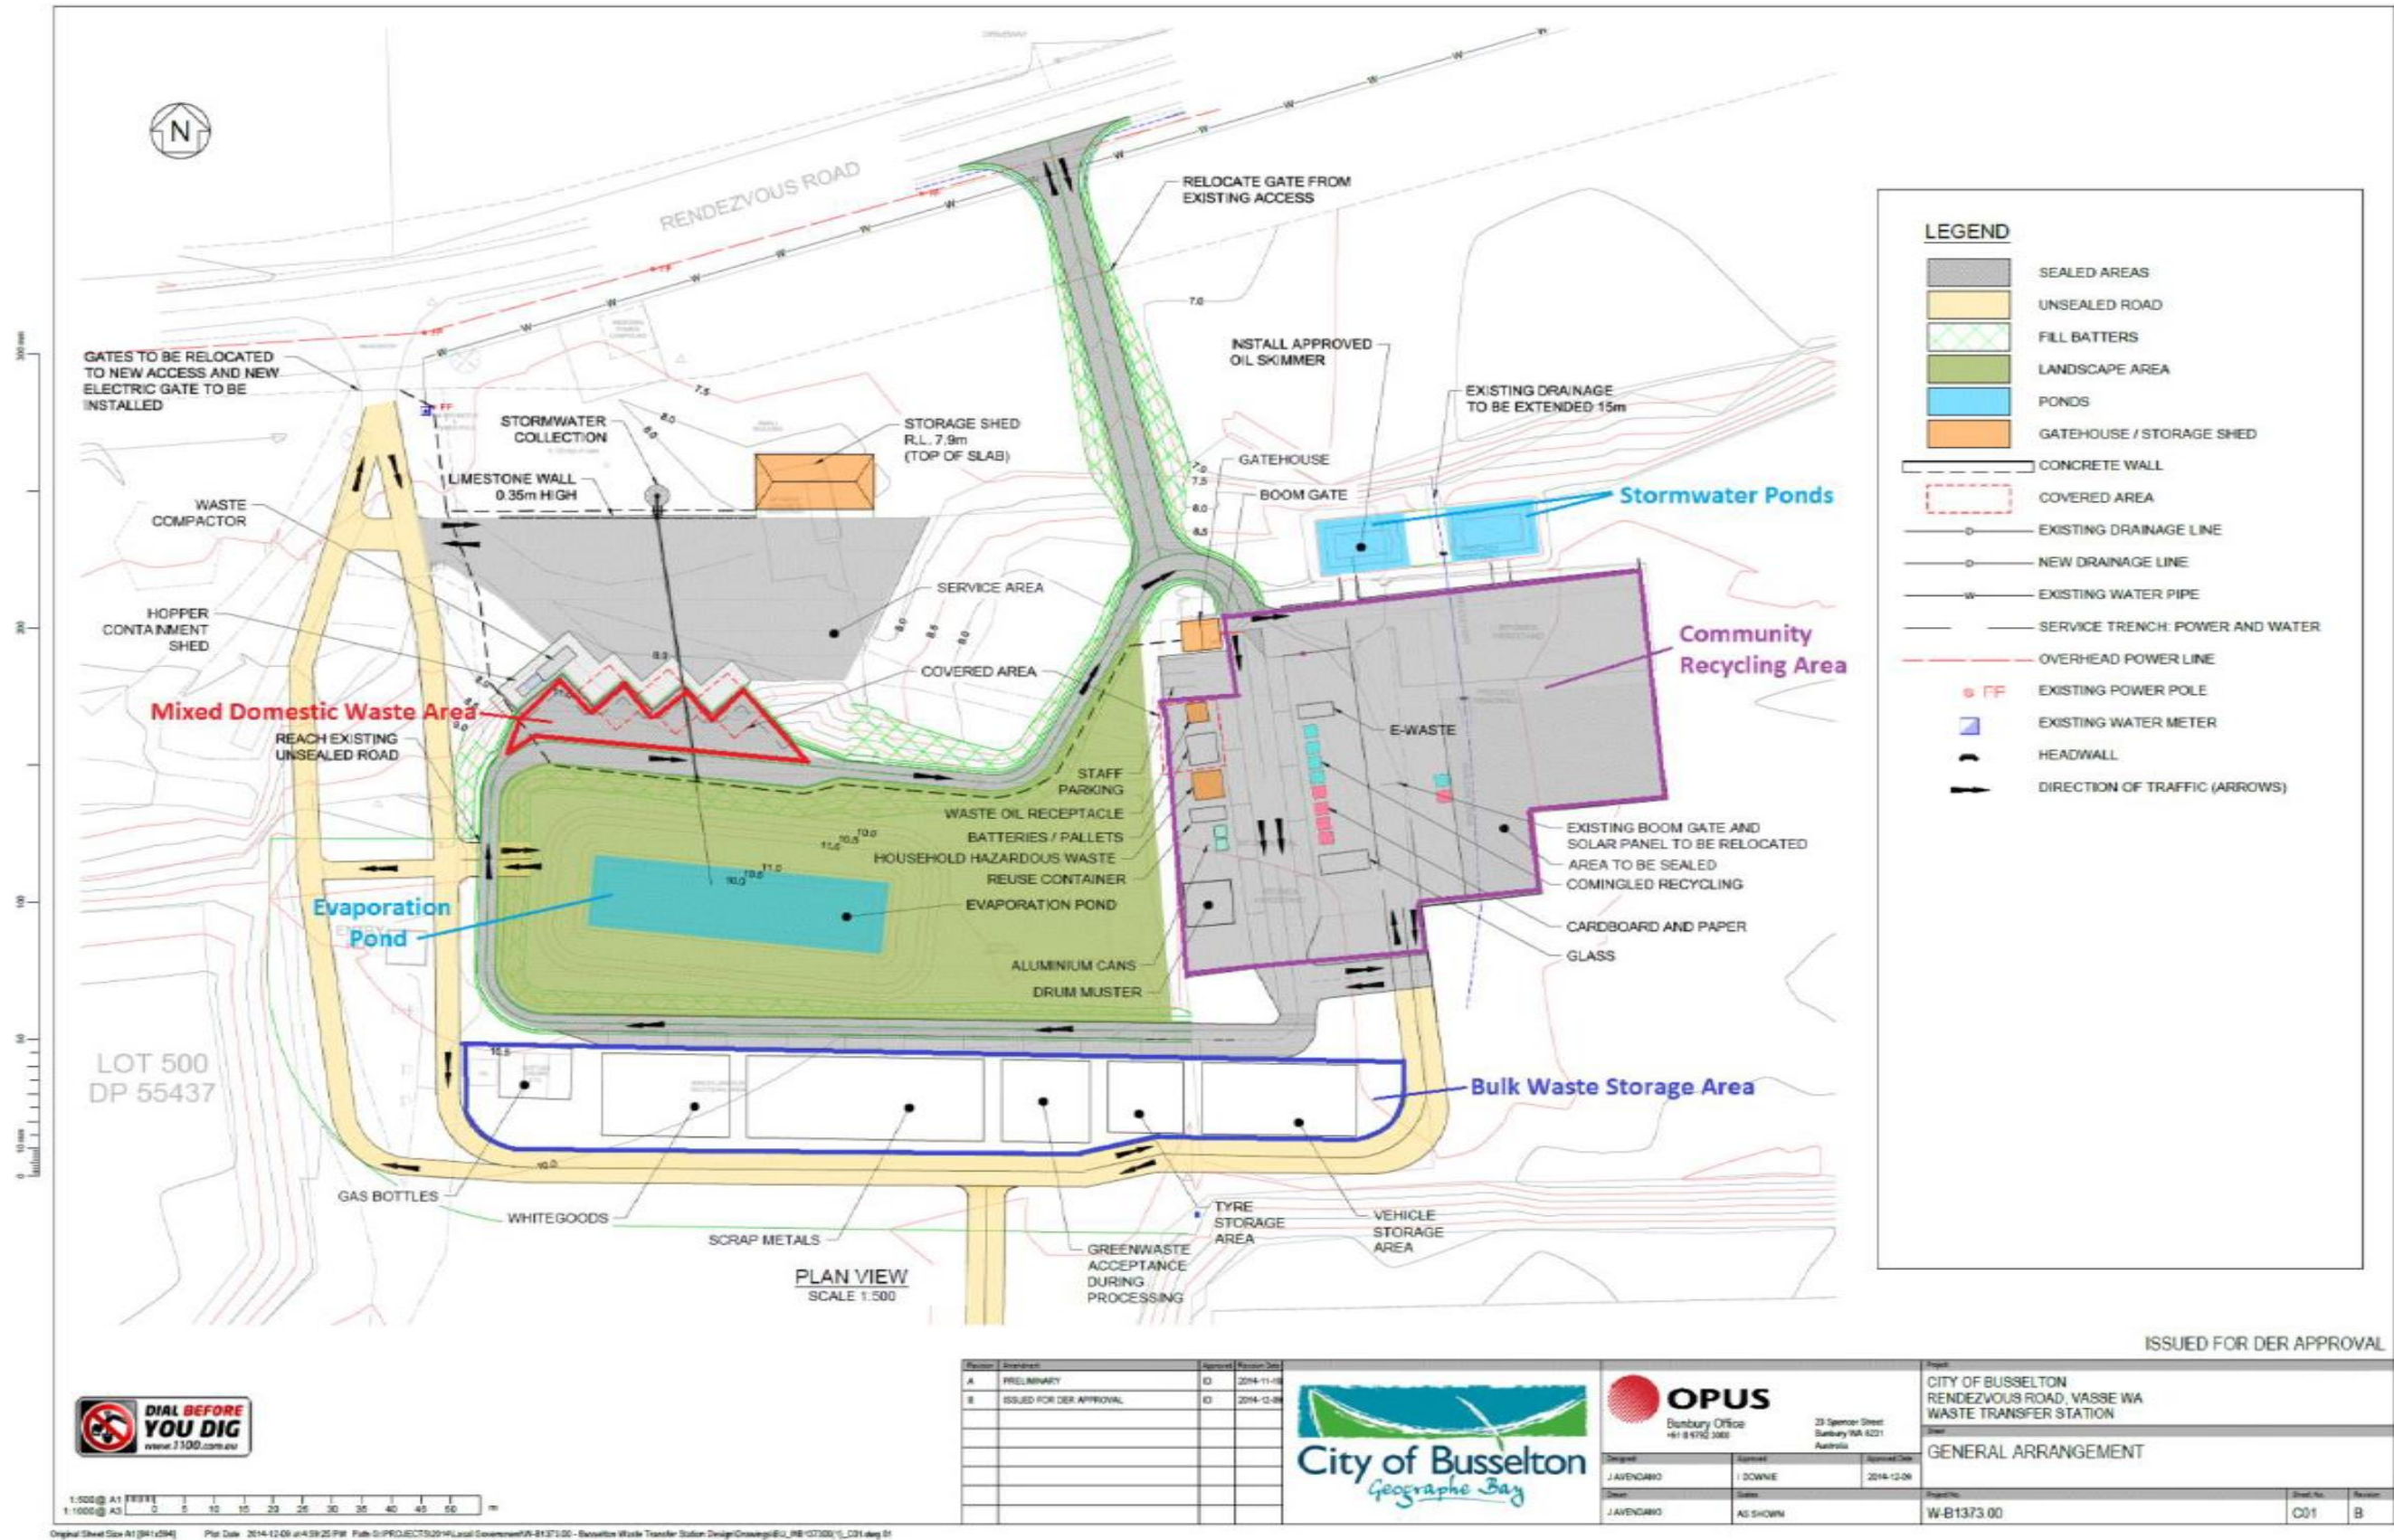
Site Plan - layout of the waste transfer station is shown in the plan above
